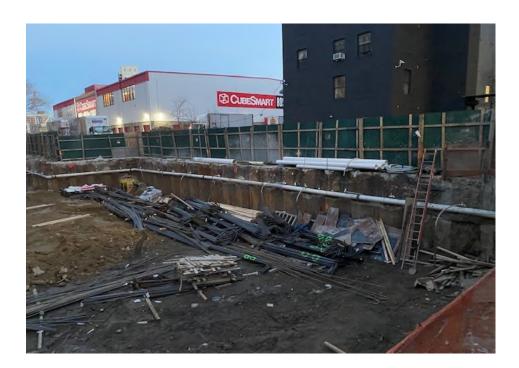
Ongoing foundation and concrete work in Grid B3, view facing northwest.
